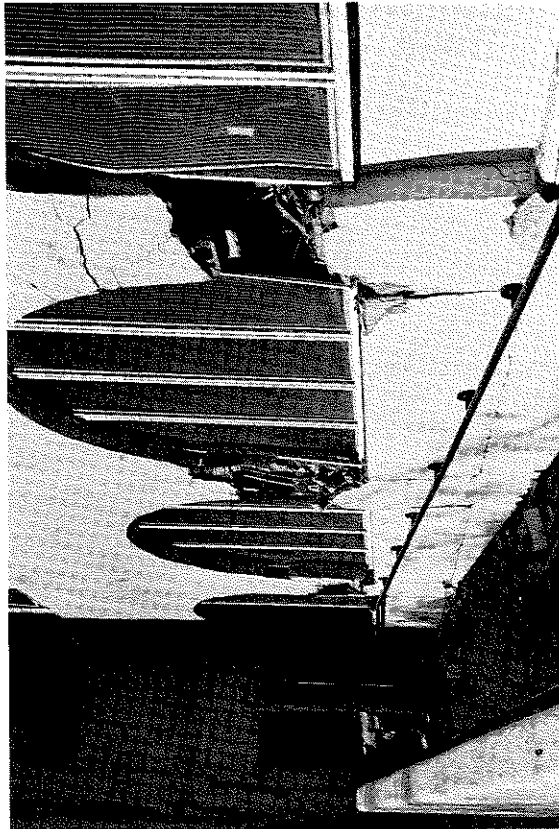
Shear failure in columns in southwest side of Men's Ambulant Building, Veterans Hospital.
